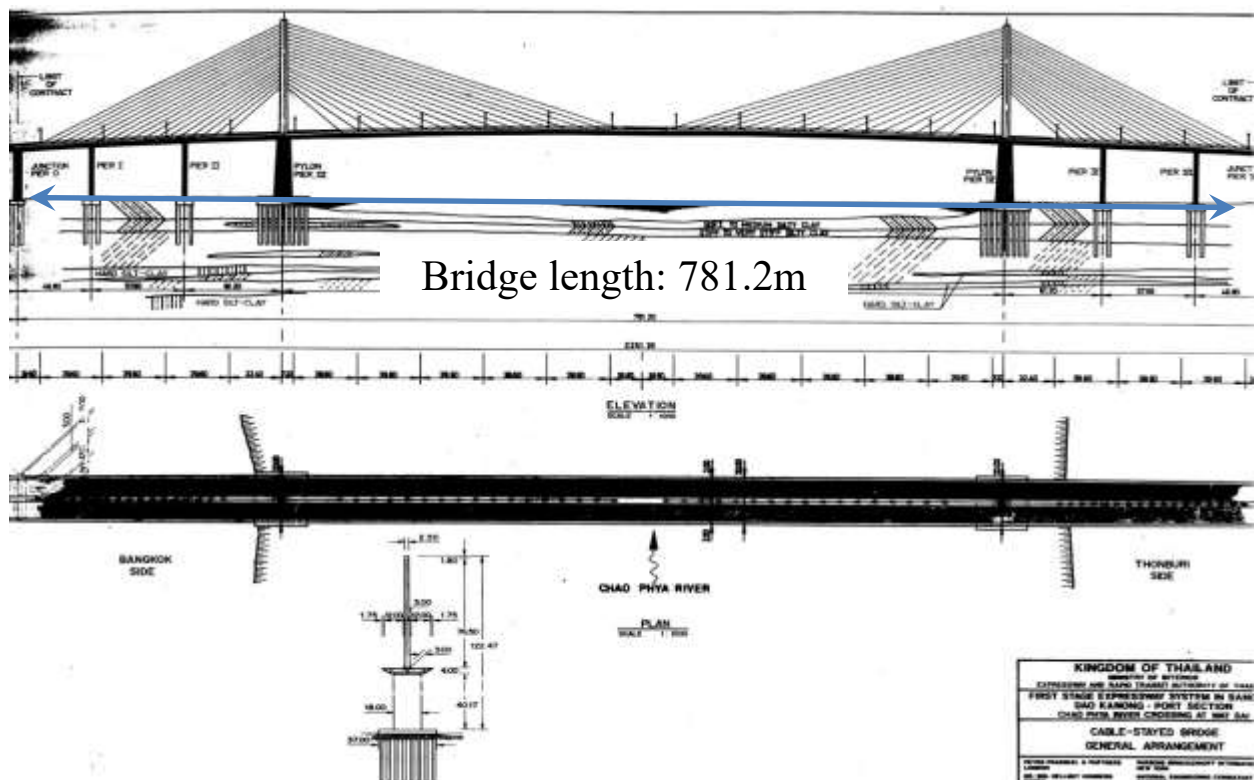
Rama IX Bridge: Side view, Plan, Cross Section of Main Tower
